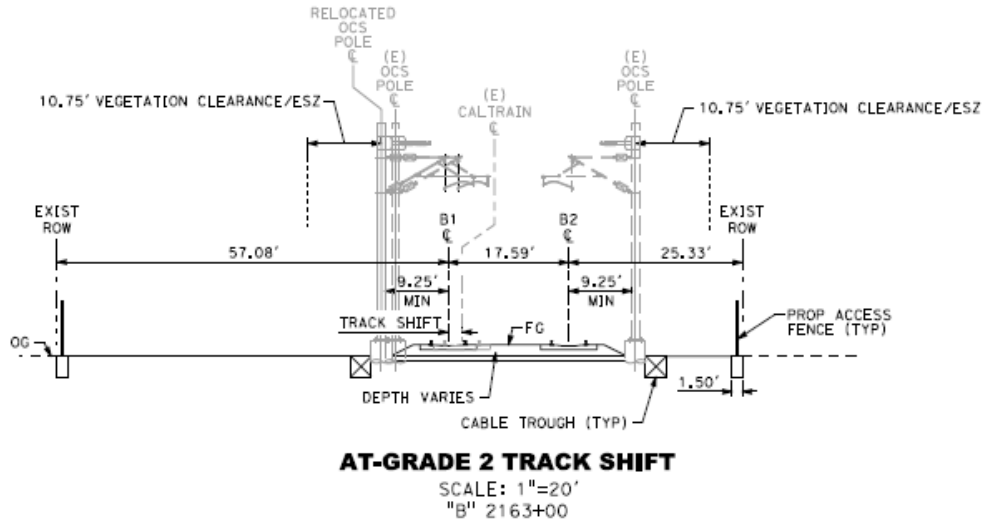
Typical Section - Mountain View to Santa Clara Subsection
